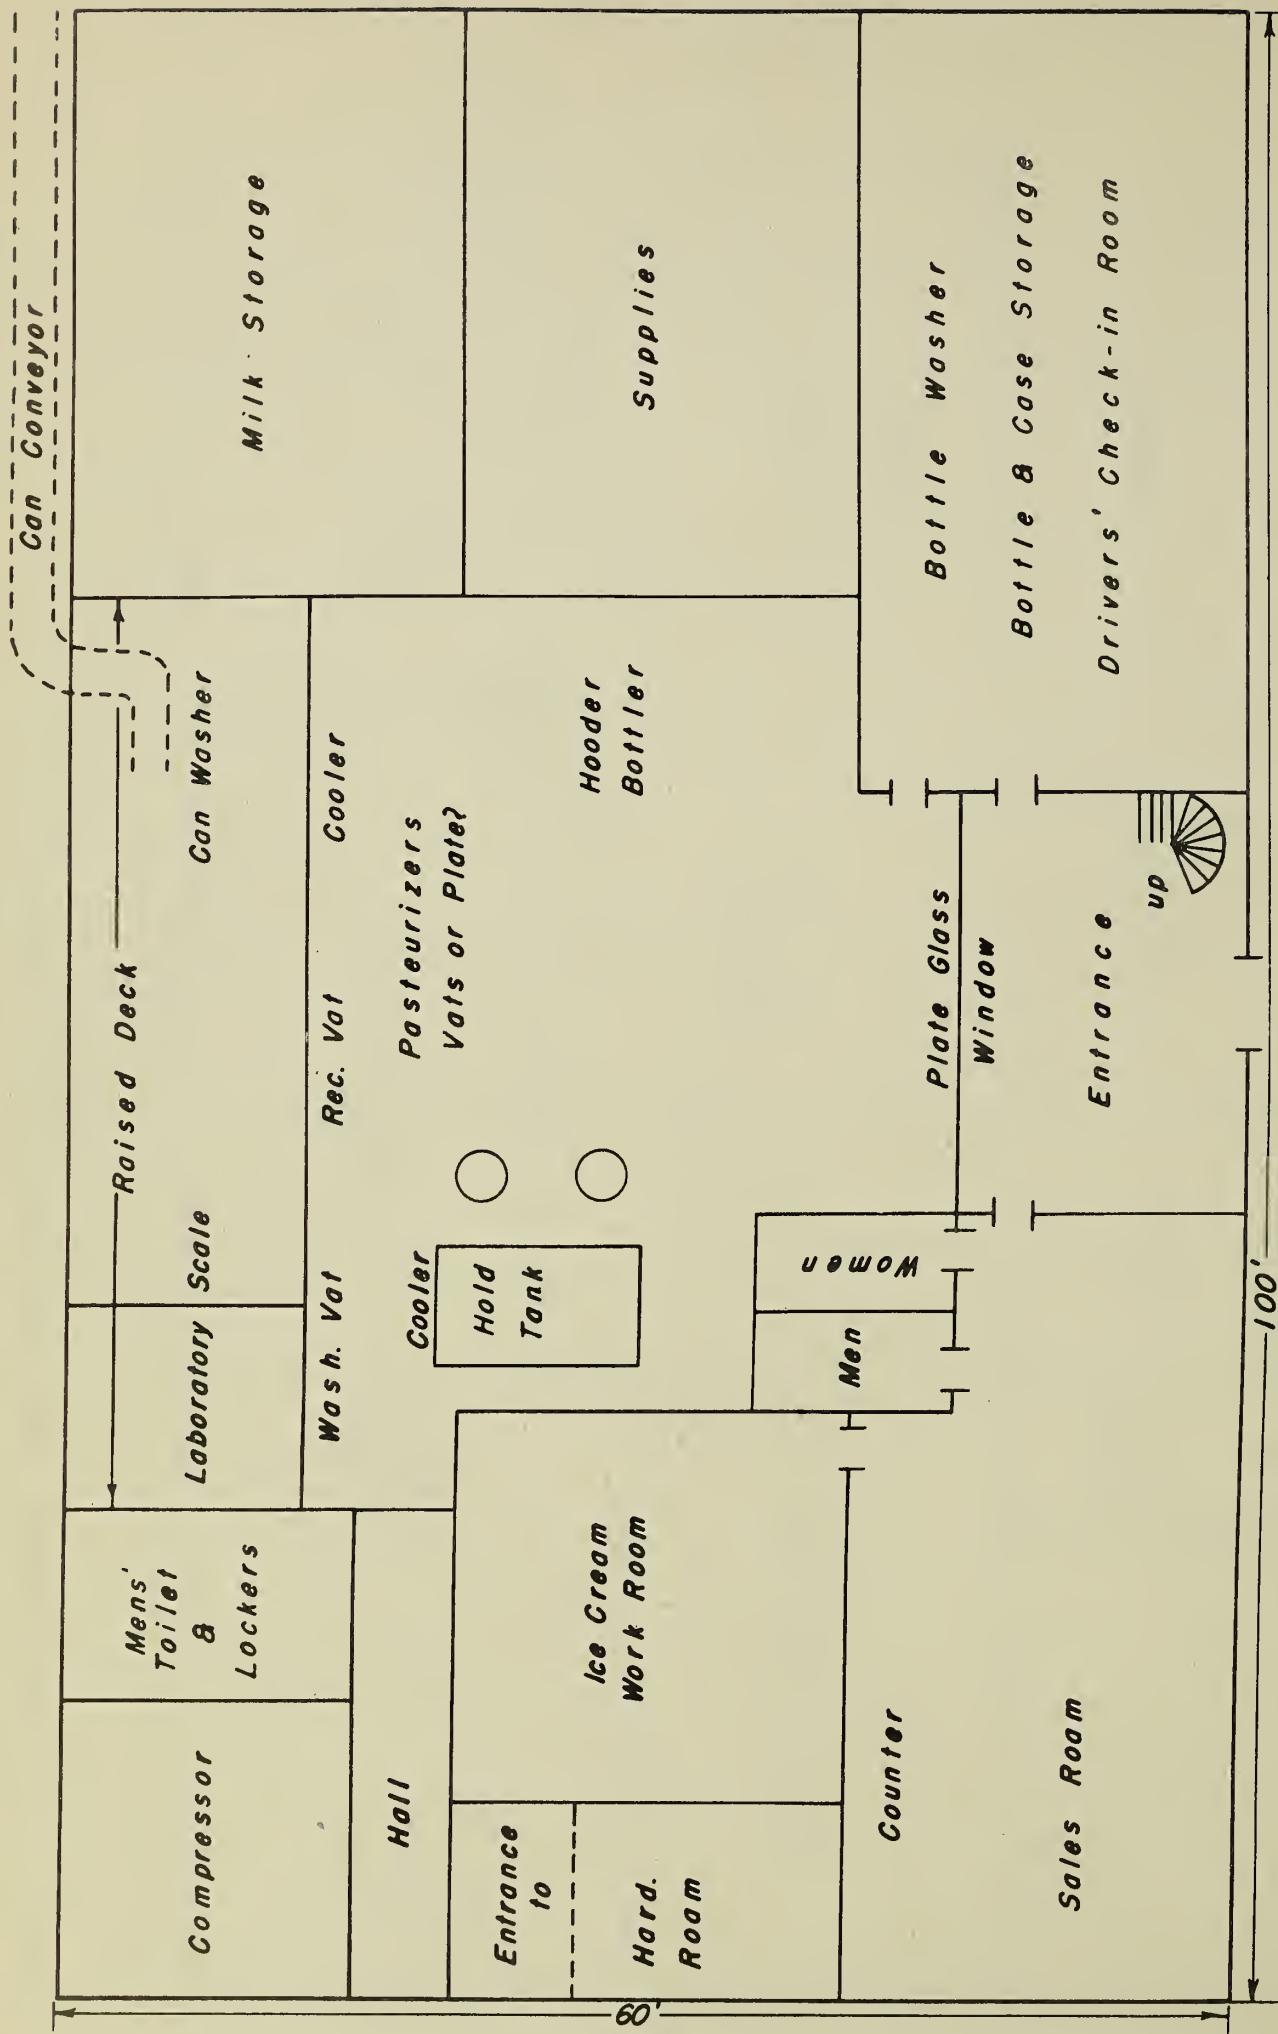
Proposed floor plan for pasteurizing plant to handle 2,000 gallons a day.
